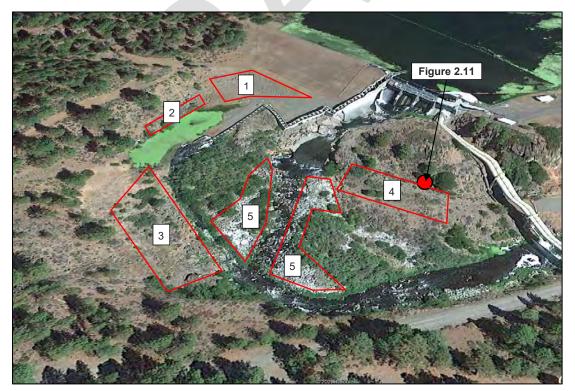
J.C. Boyle Downstream of Dam Potential Borrow Source
